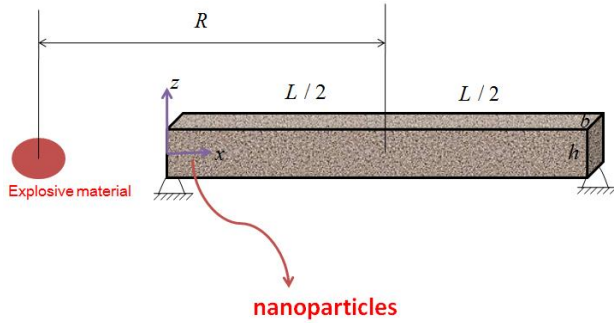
Concrete beam reinforced with silica-nanoparticles under blast load
